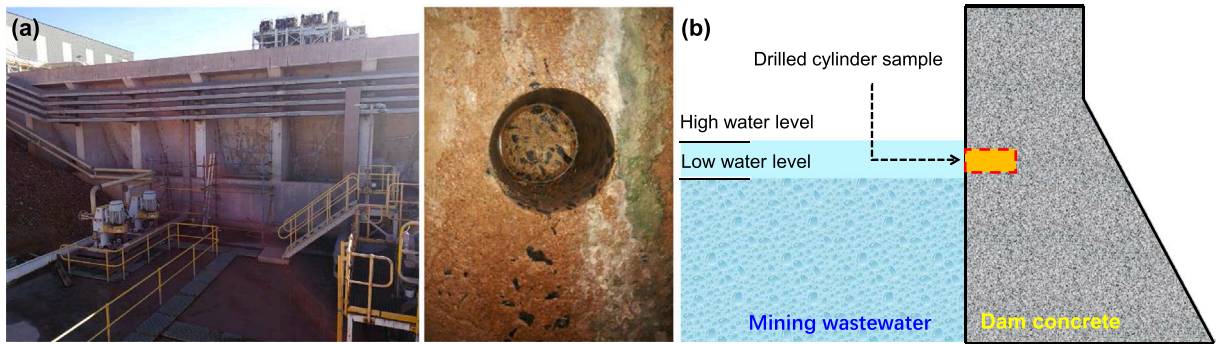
Concrete sampling process: (a) on-site dam in Western Australia (2022); (b) the cylinder specimen drilled from the concrete dam interacted with the wastewater.
